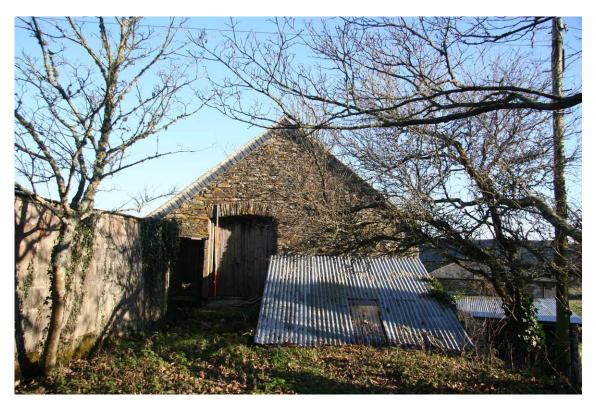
NW Stable, SW elevation and upper floor loading doorway
